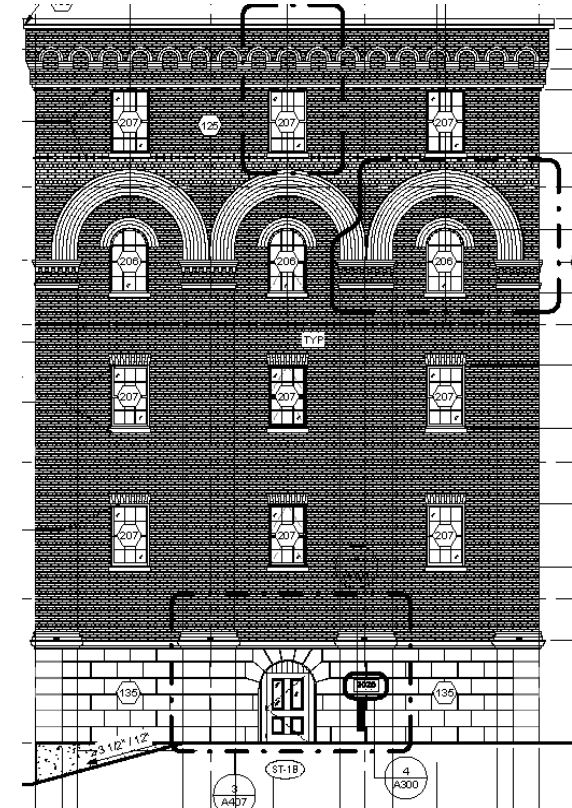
Longworth Hall - "After" (The image above shows how the east façade will be reconstructed as well as the bridge approach diagram.)
